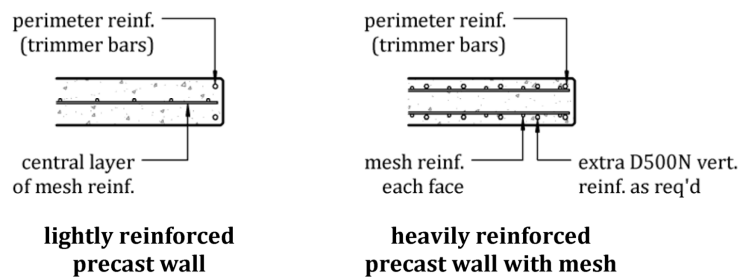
Typical detailing of precast RC walls in Australia (Menegon, 2018)
